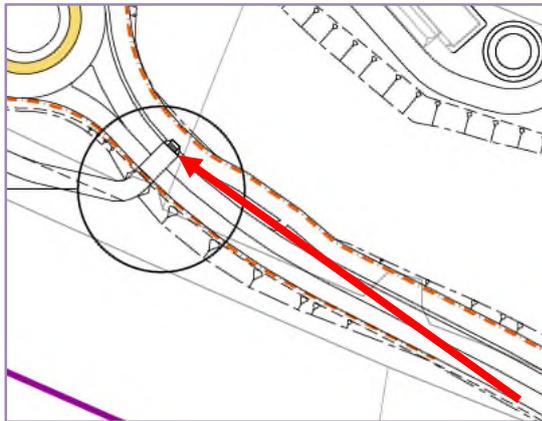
EW5604-00-030 Rev O, New Site Access Proposed Pedestrian Access and Cycleway &
